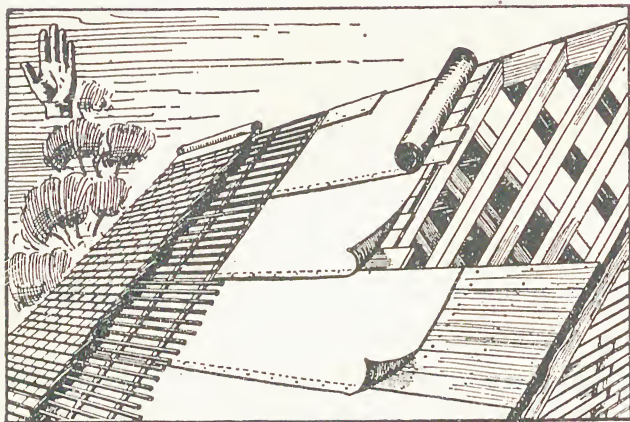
Tiled roof with counter-battens, battens, underfelt, and boarding. (Courtesy of D. Anderson & Son, Ltd.)
